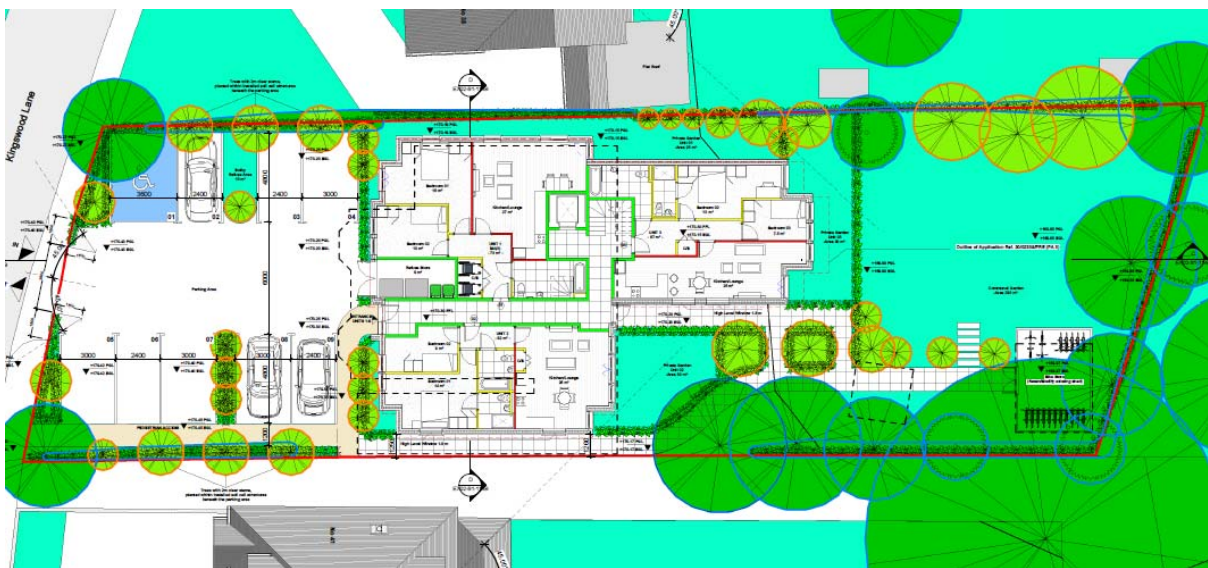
Proposed site plan showing proposal in relation to neighbouring properties
